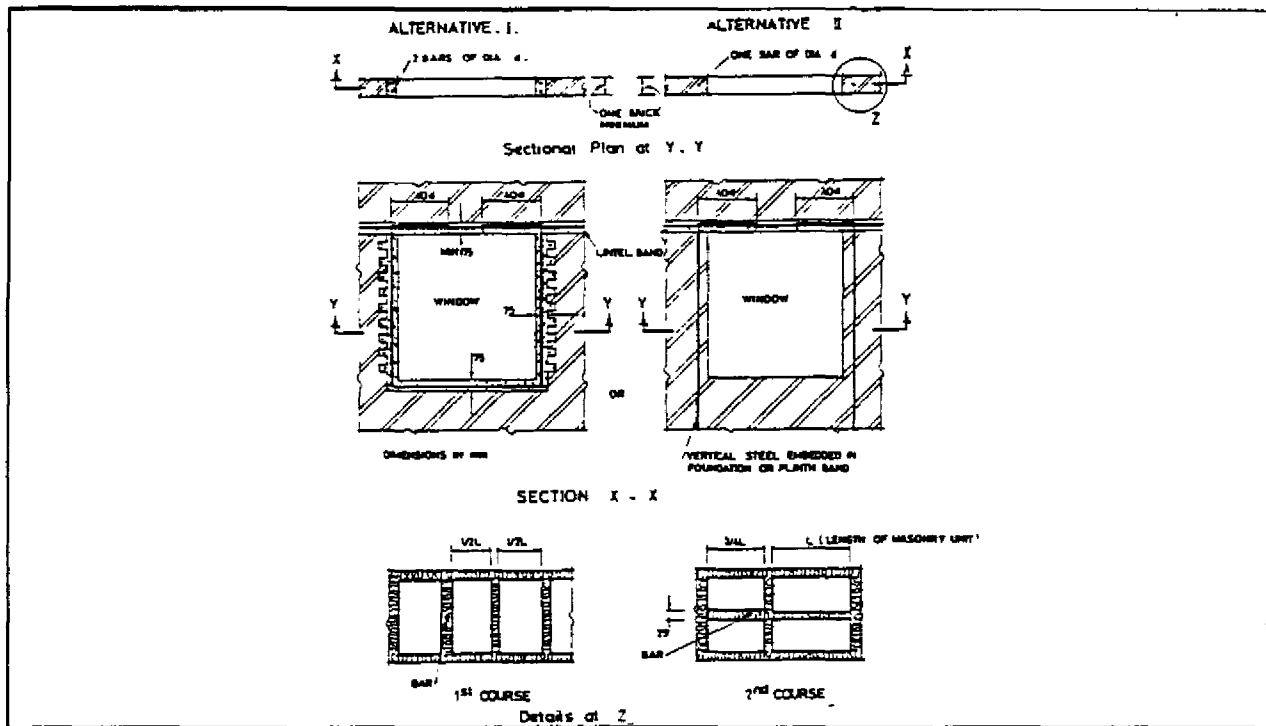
Reinforcement of Masonry around Openings [1]
